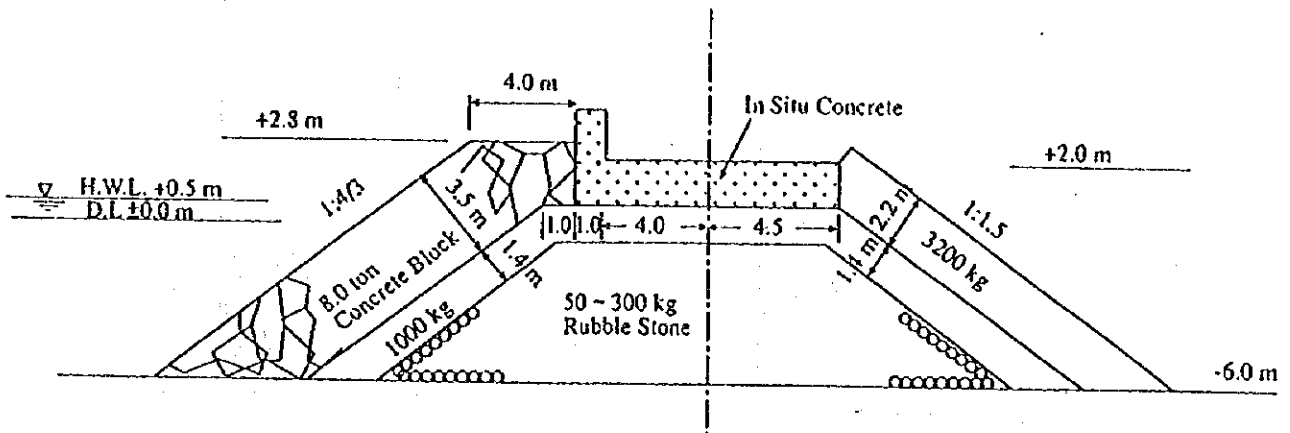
Standard Cross Section of Breakwater (-6.0m)
